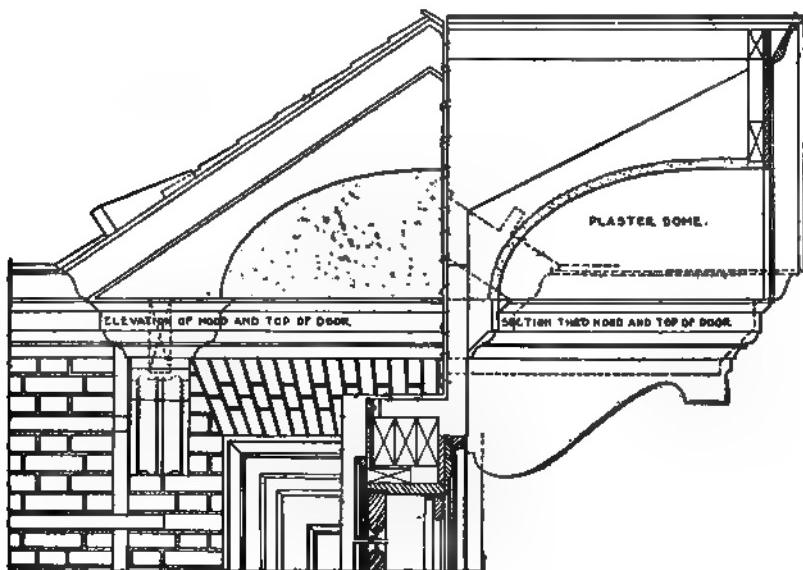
Hood Over Entrance Door. Elevation and Section.
